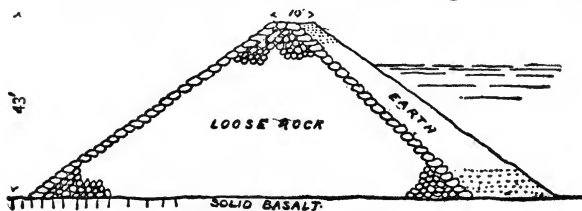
CROSS-SECTION OF IDAHO DAM.
